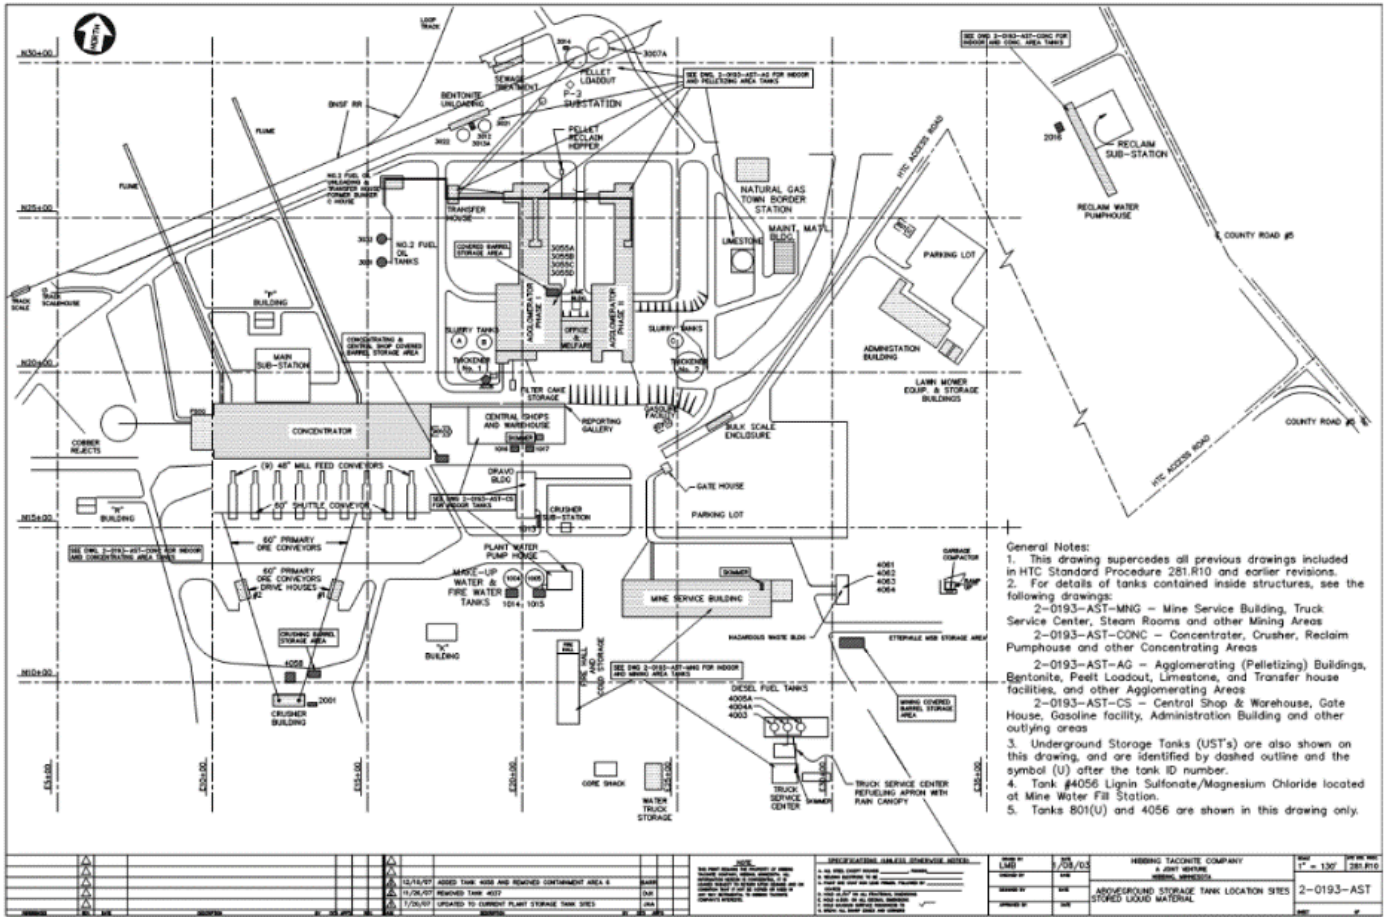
Hibbing Taconite Facilities General Arrangement Drawing
